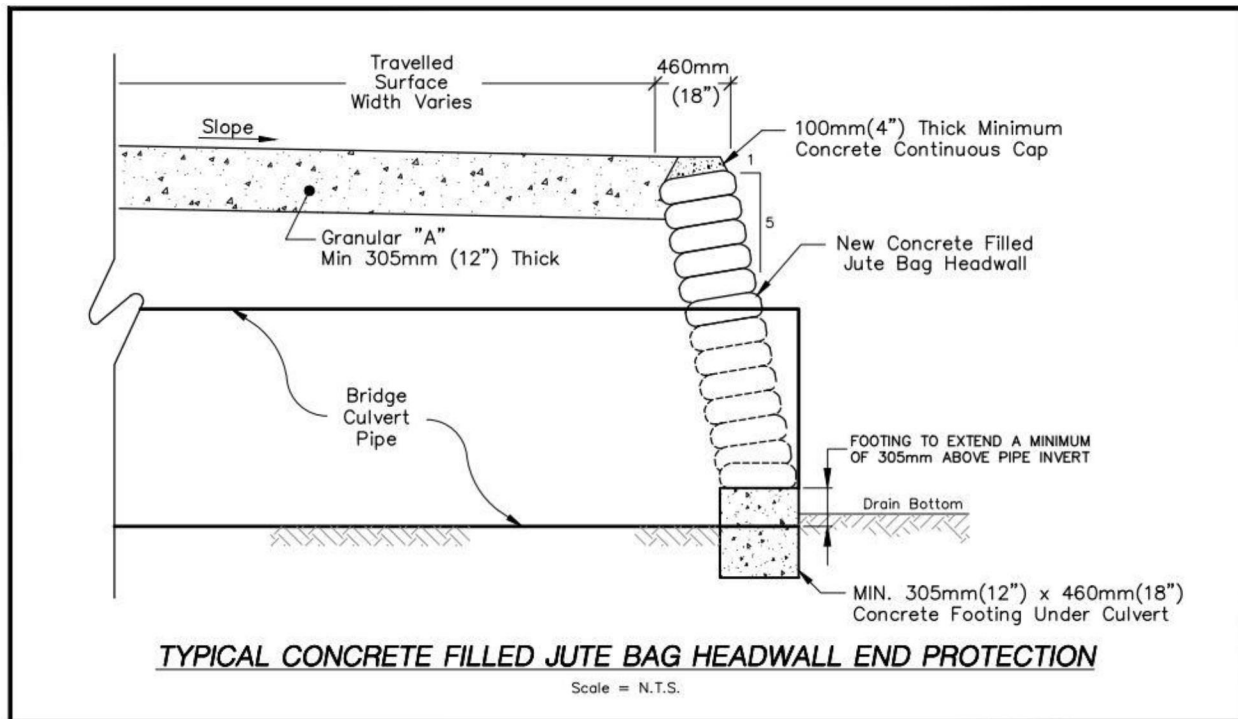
Typical Concrete Filled Jute Bag Headwall End Protection Detail
